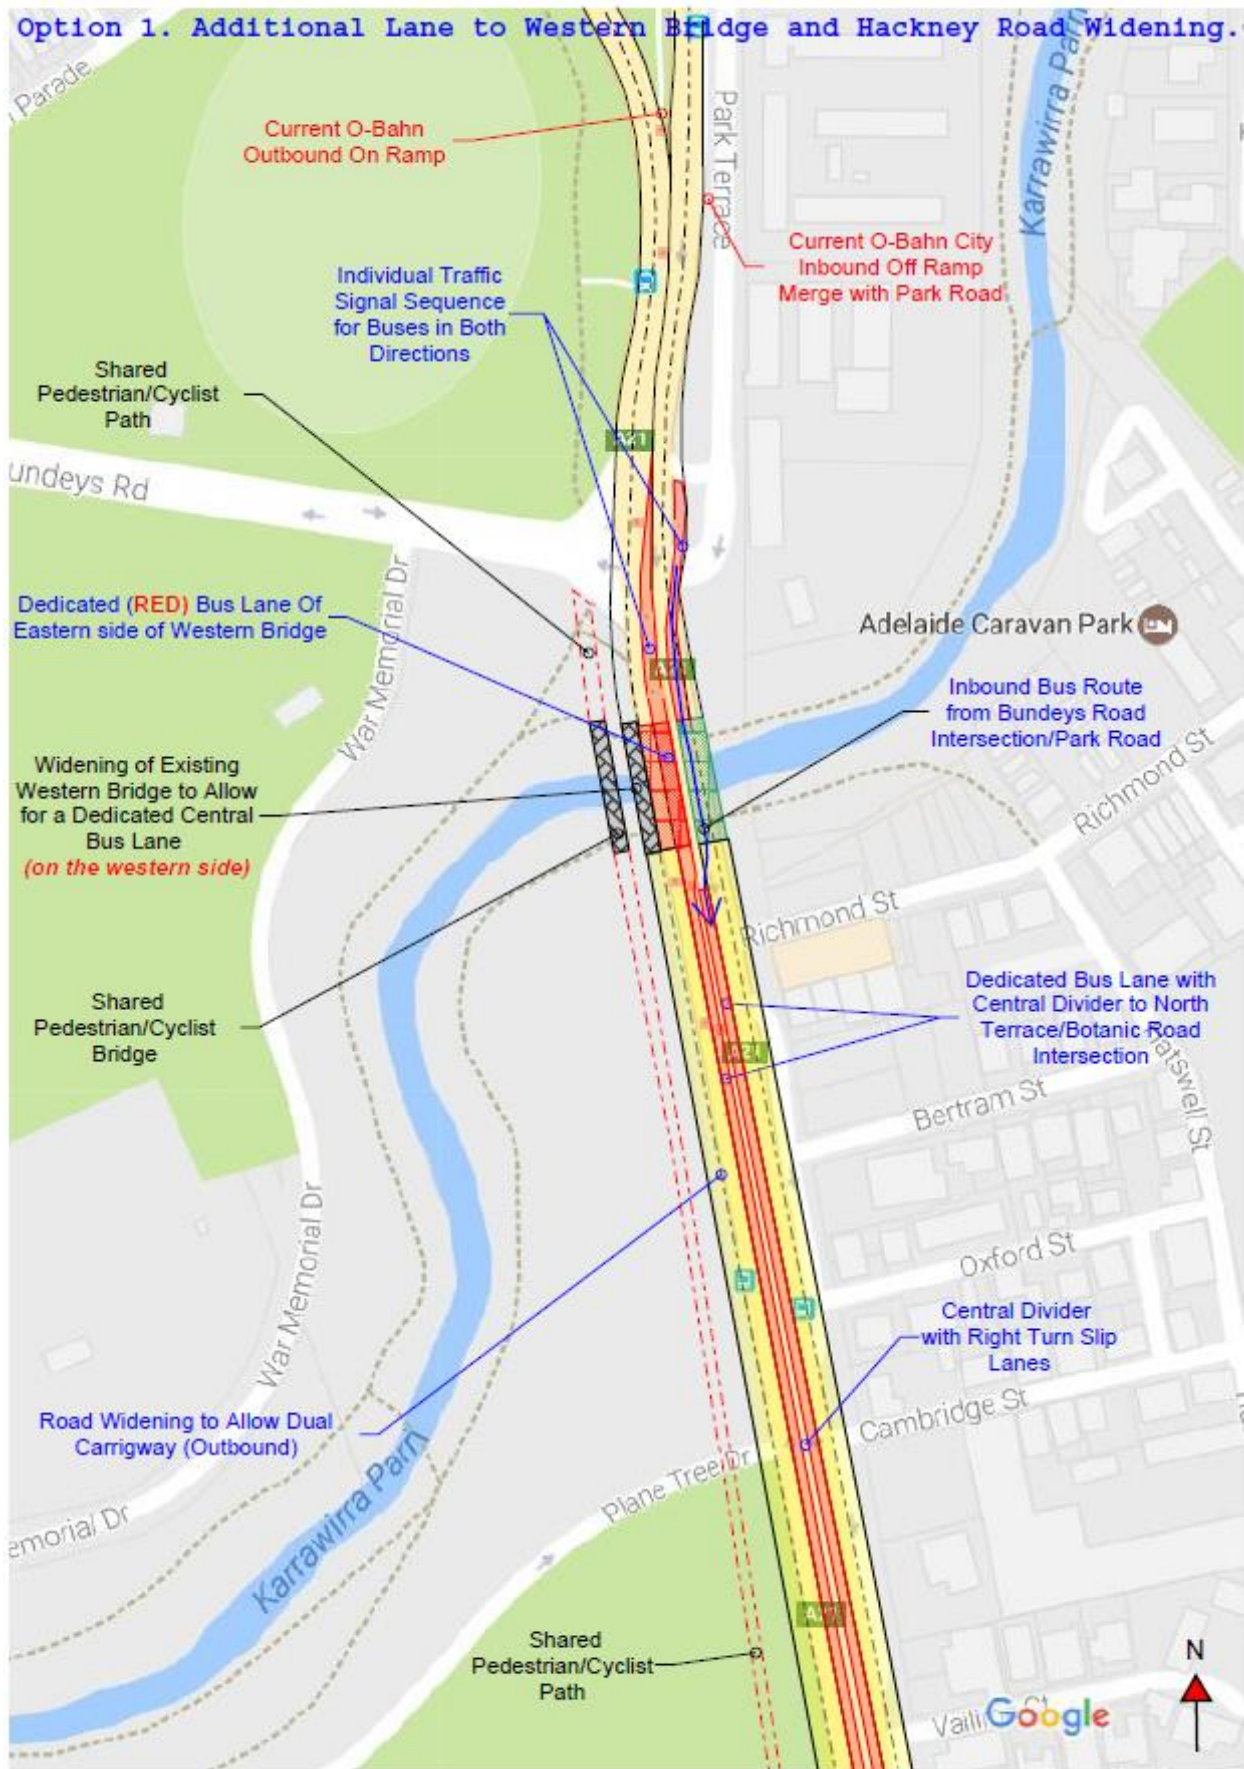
Option 1 – Additional lane to western bridge and Hackney Road widening.
